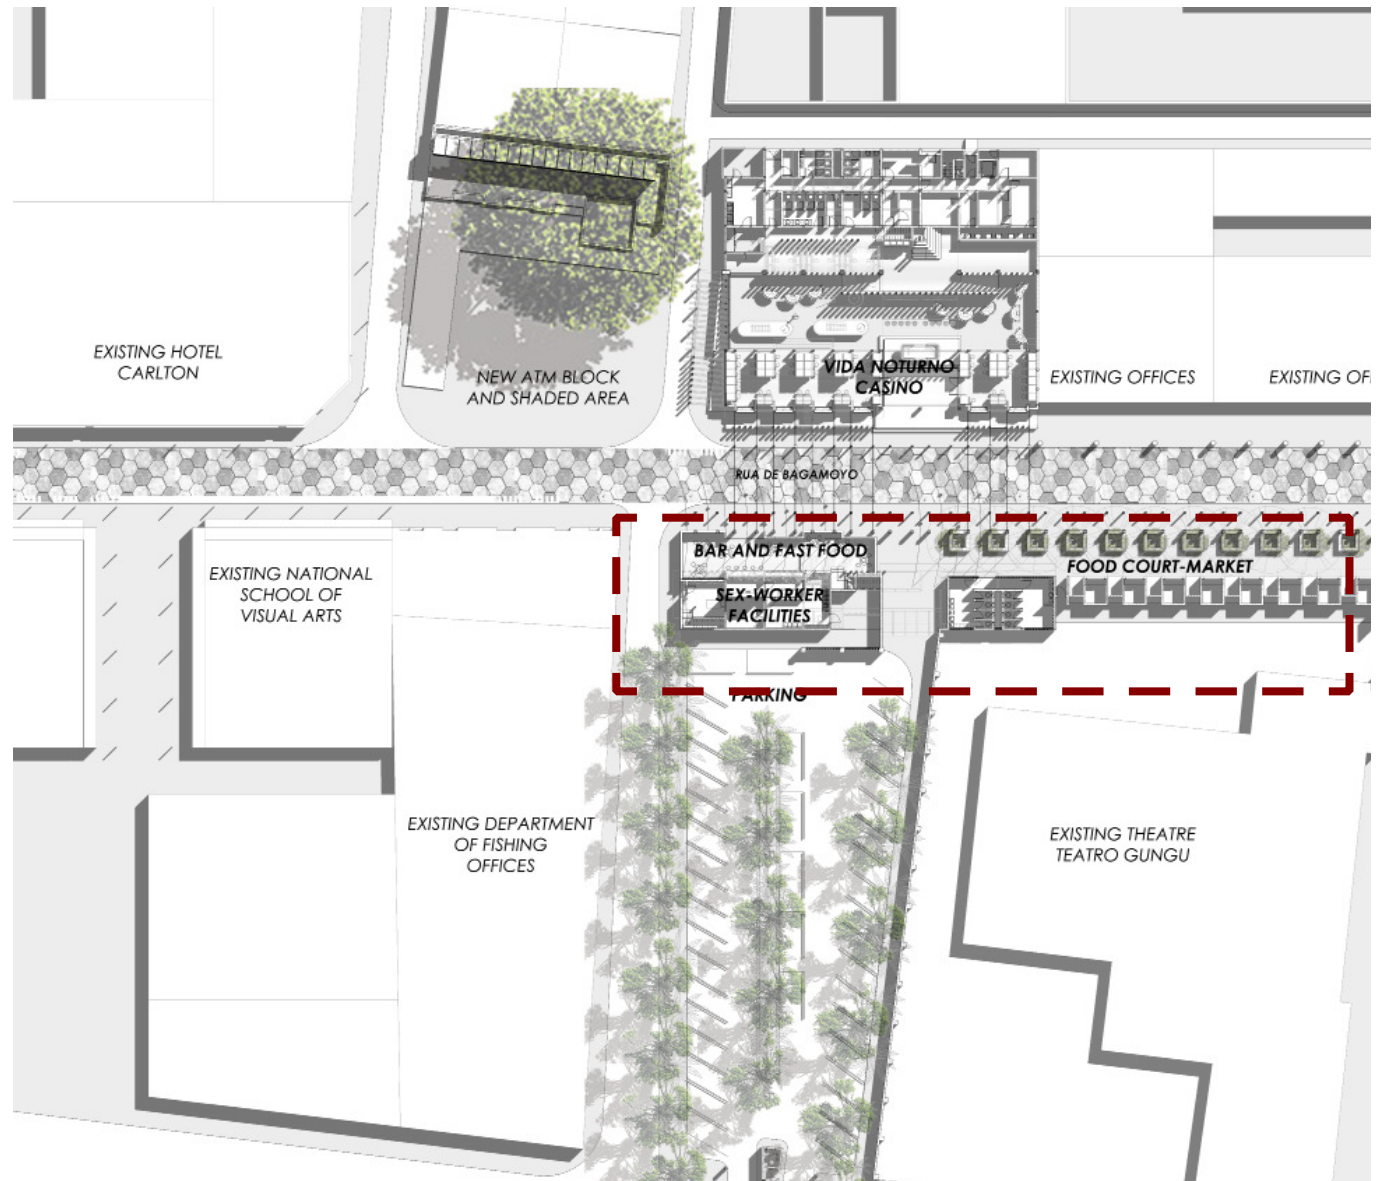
Site plan indicating position of "food court" market and food service spaces.
